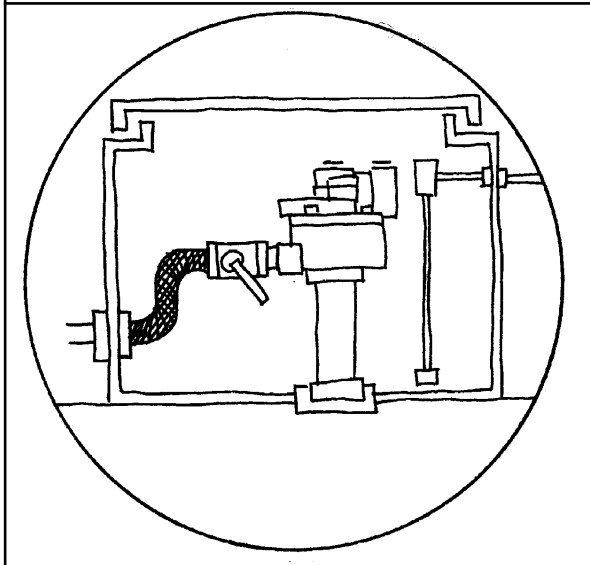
A submersible pump manifold in a containment sump, where piping and electrical connections are housed.
